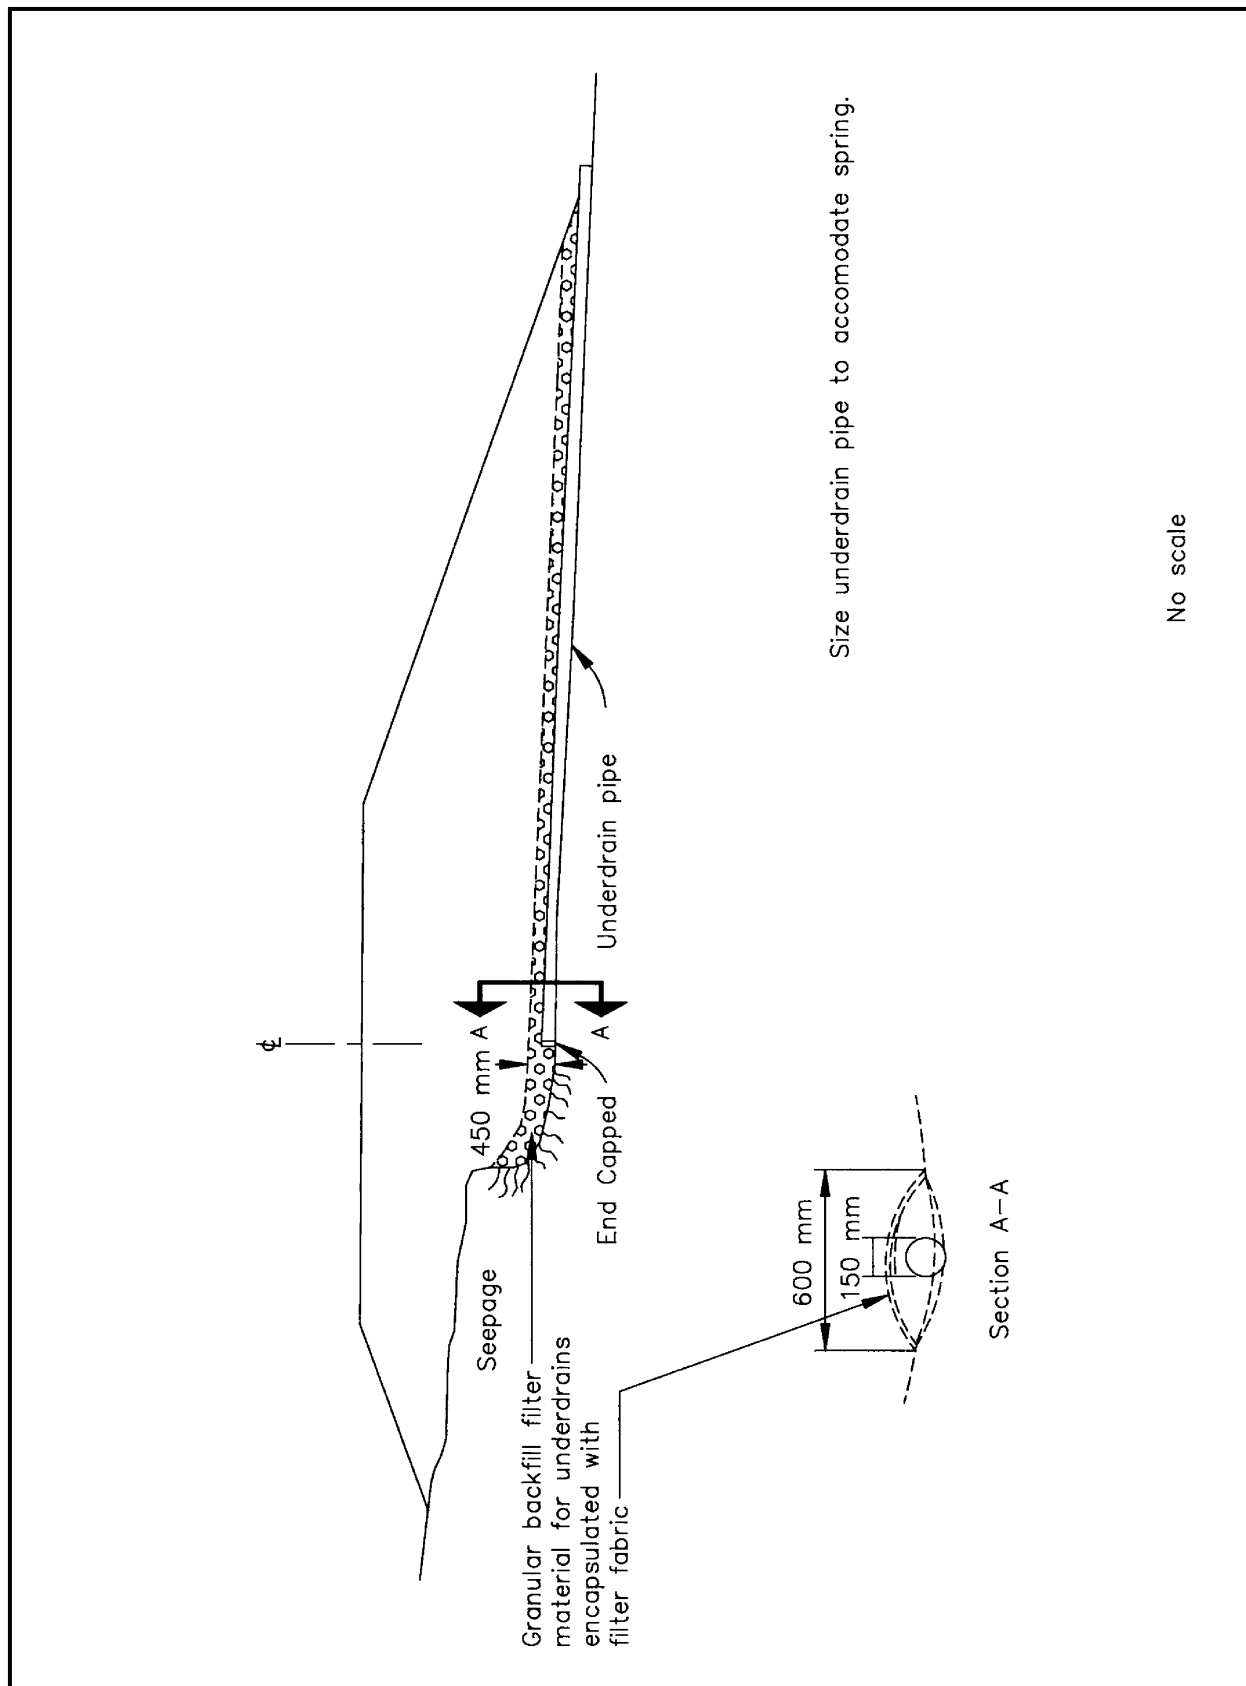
DD TYPICAL UNDERDRAIN INSTALLATION BENEATH THE ROADBED
